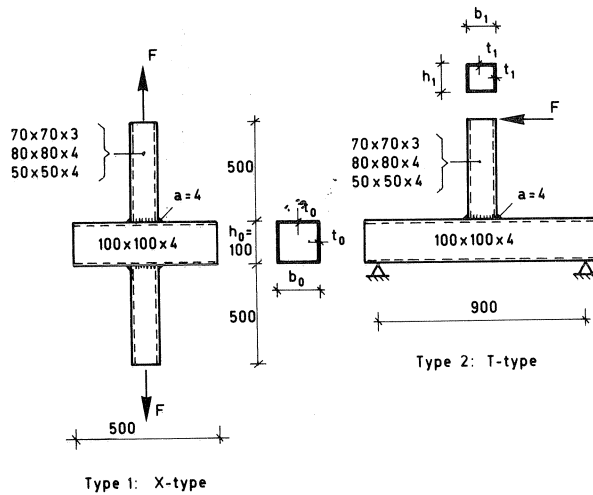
Types of hollow sections investigated; dimensions in mm; loadings.
